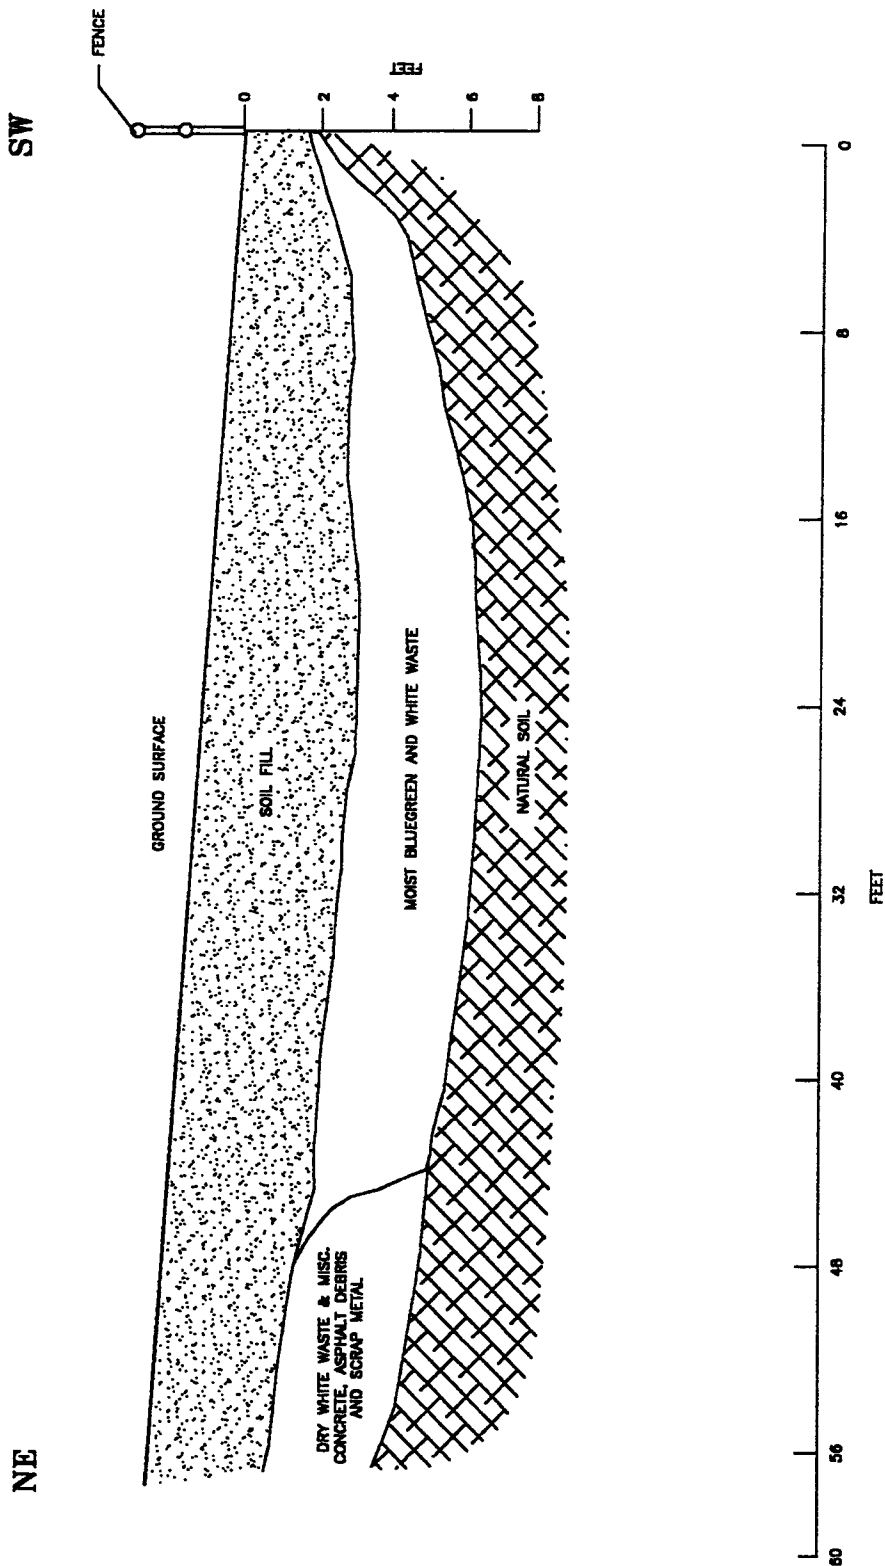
FIGURE:	LANDFILL INVESTIGATION TEST PIT CROSS SECTION TEST PIT 8 LAURENS CERAMICS SITE LAURENS, SOUTH CAROLINA
